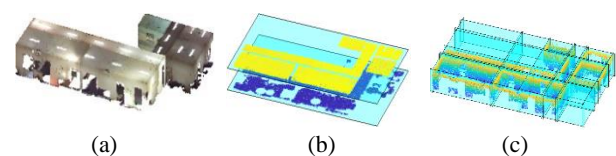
Extraction of potential permanent structures of a building interior: (a) a point cloud as input data, (b) extraction of horizontal structures from horizontal points, (c) extraction of vertical structures from vertical points.
